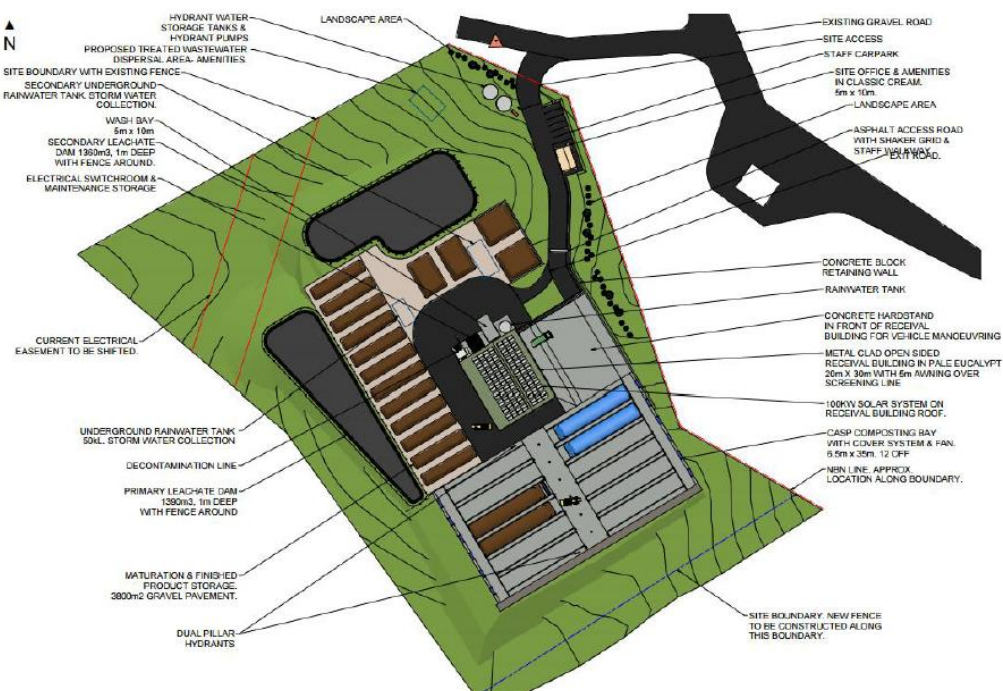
Phase 2 Site Plan (Source: Soilco Design Drawings, 08/07/25)
